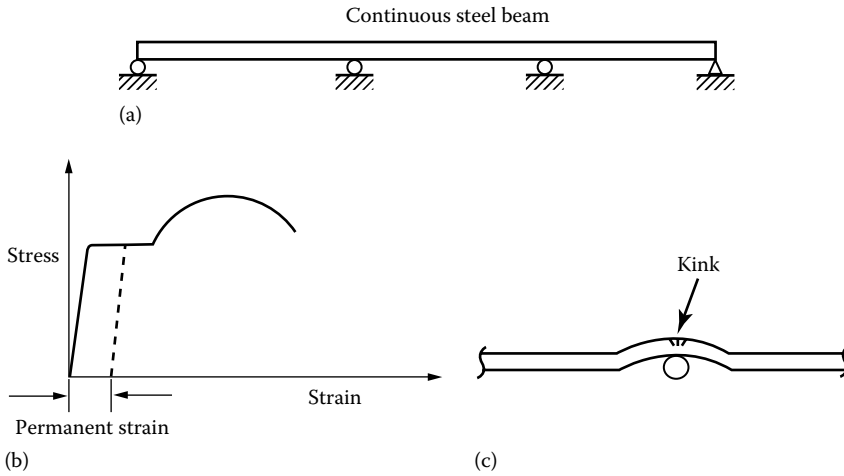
Permanent deformation in a continuous steel beam due to accumulated permanent strains: (a) a continuous steel beam, (b) stress–strain curve for steel showing permanent strain, and (c) a permanent *kink* in the beam. (Adapted from Nowak, A.S. and Collins, K.R., *Reliability of Structures*, CRC Press, Boca Raton, FL, 2013.)
